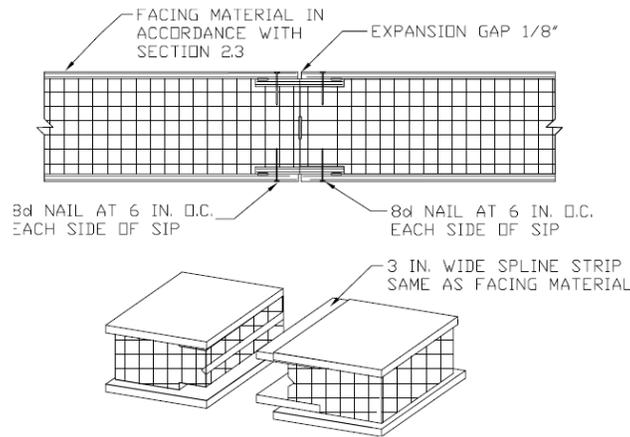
Surface Spline (Structural Insulated Panel Association, 2007)
